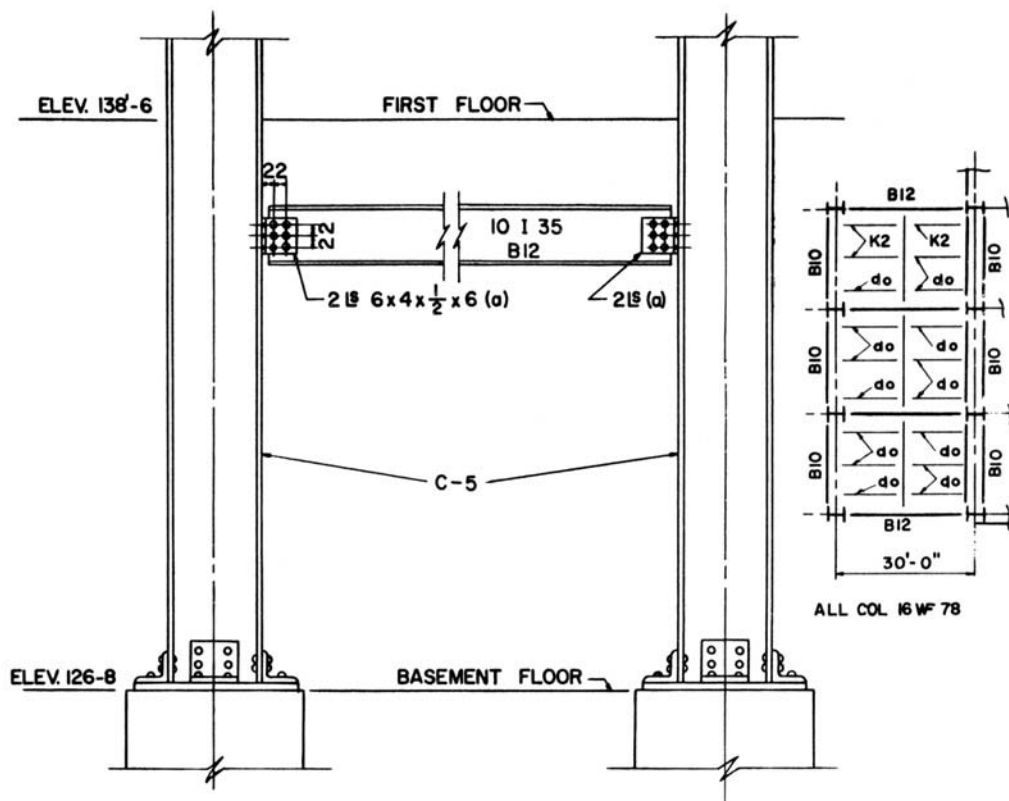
This detail drawing illustrates the steel frame construction that would be a part of some larger piece of architecture.
